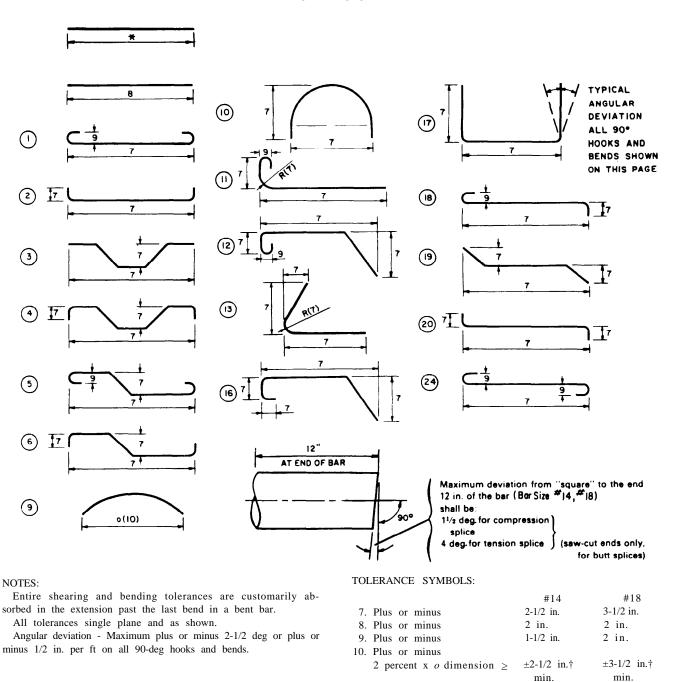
(b) - Standard fabricating tolerances for bar sizes #14 and #18
